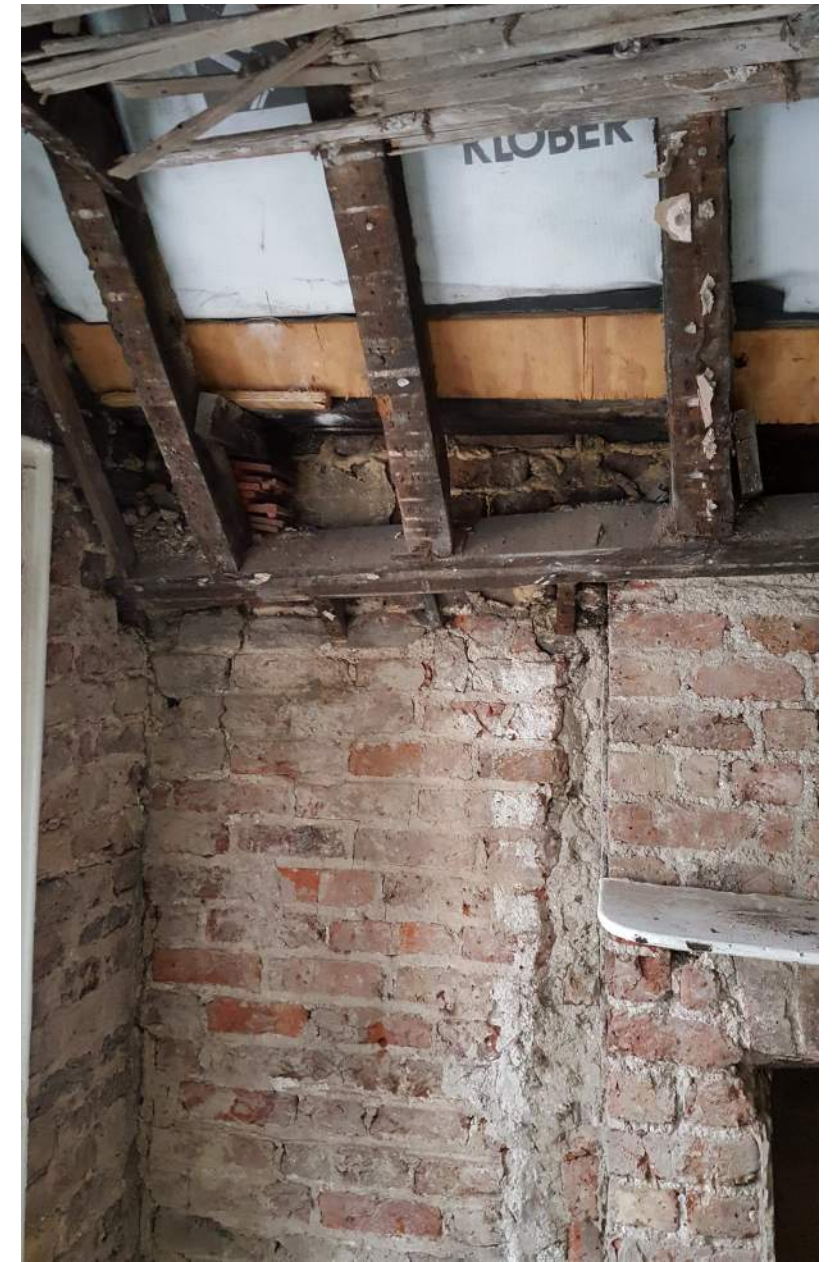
, Typical Decayed Timber Repair - Roof Rafters & Bearing Plate Shown
